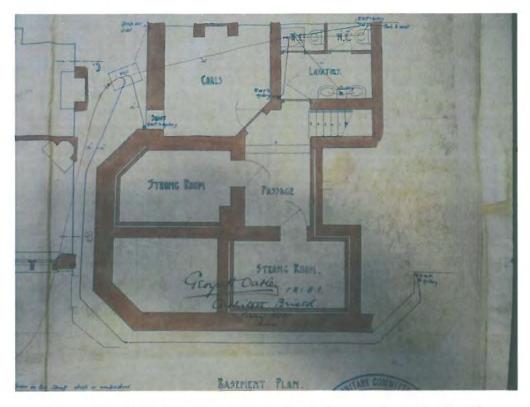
Plan of All Saints' House; basement level before extension to the right side
